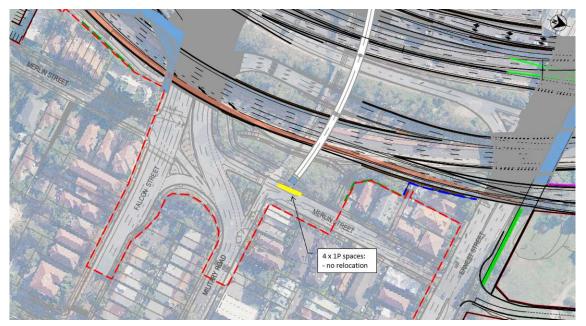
Temporary loss of parking spaces in Merlin Street
